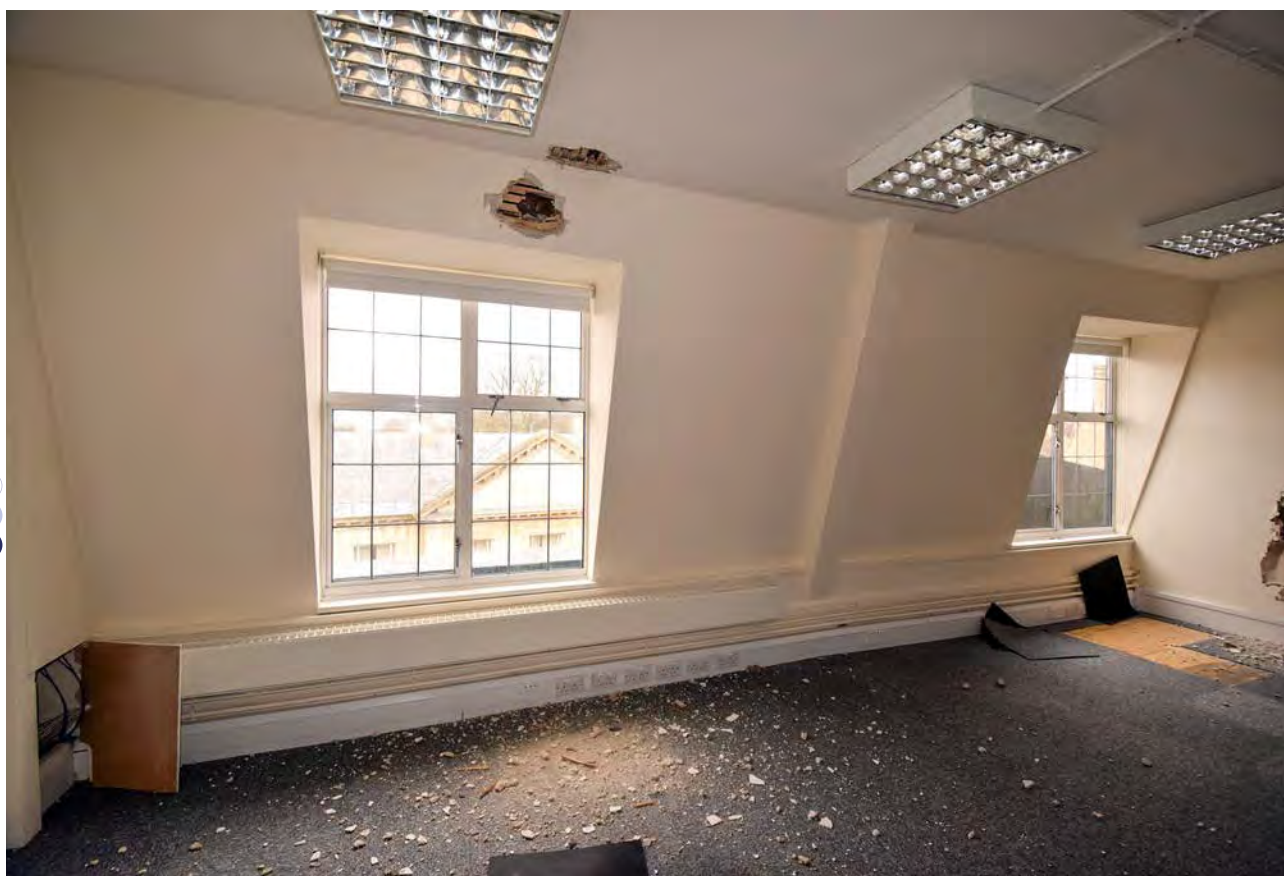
The fourth floor of the Oxford Language School, looking north-east
